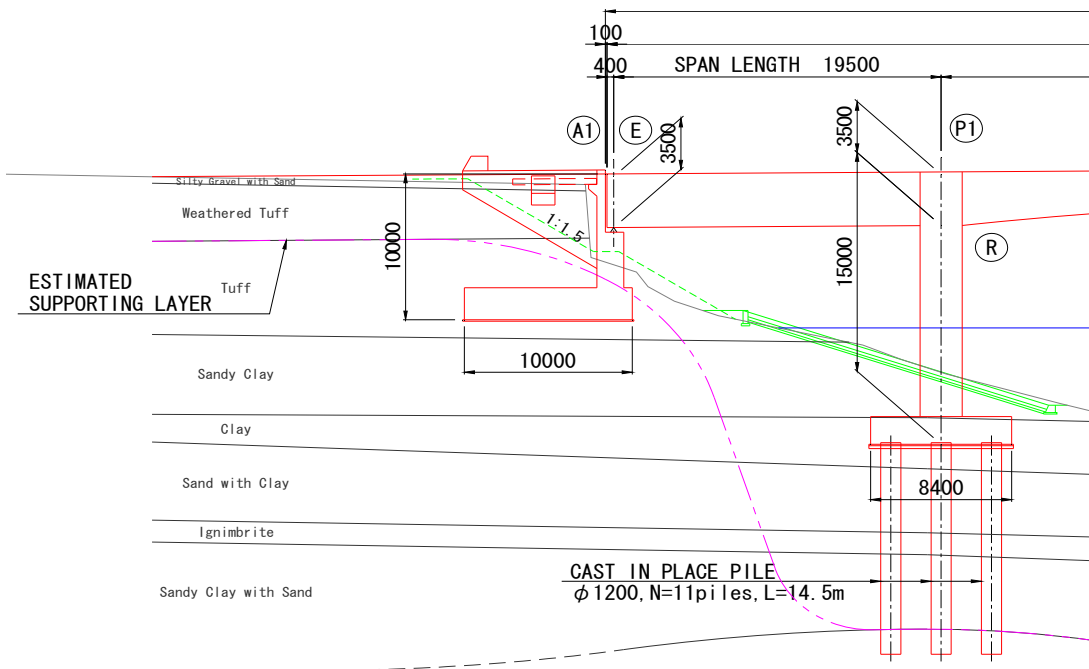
Shape and height of the substructure works (1/2) (Modjo Bridge)
